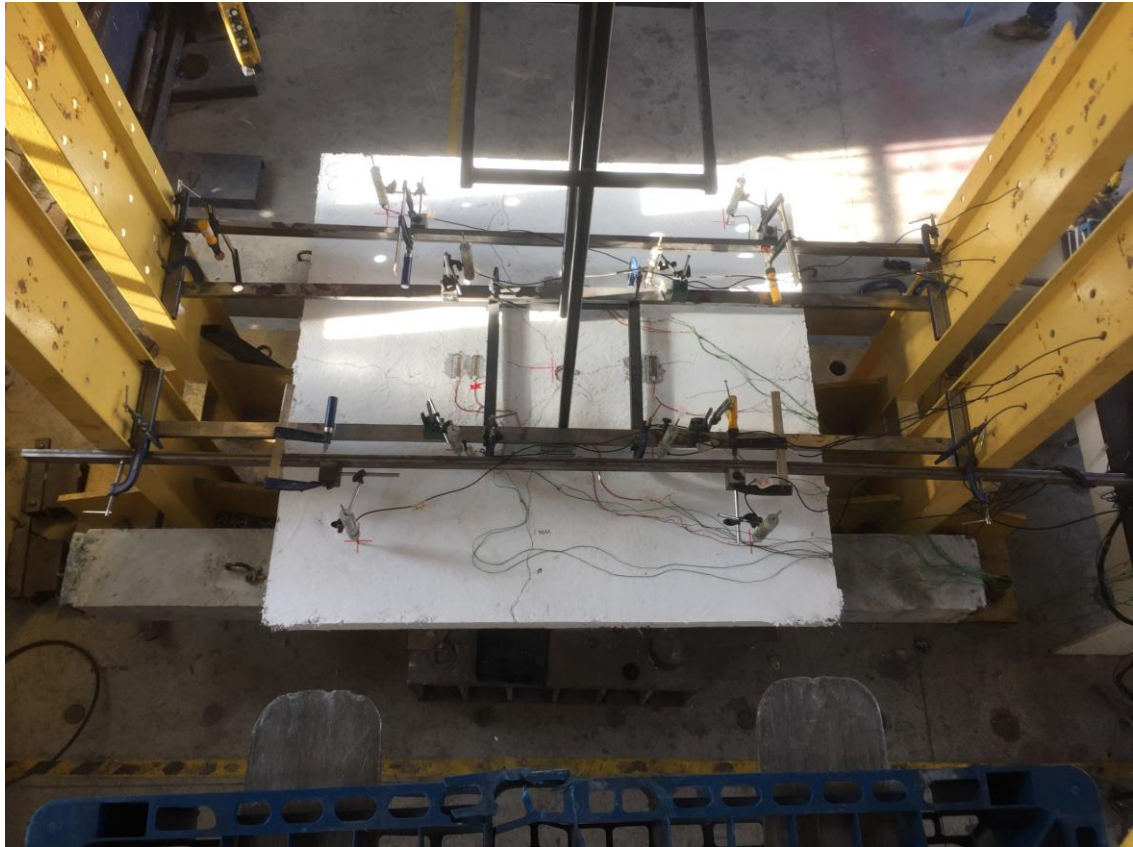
Final Crack Patterns for Impact Test Specimen M3
